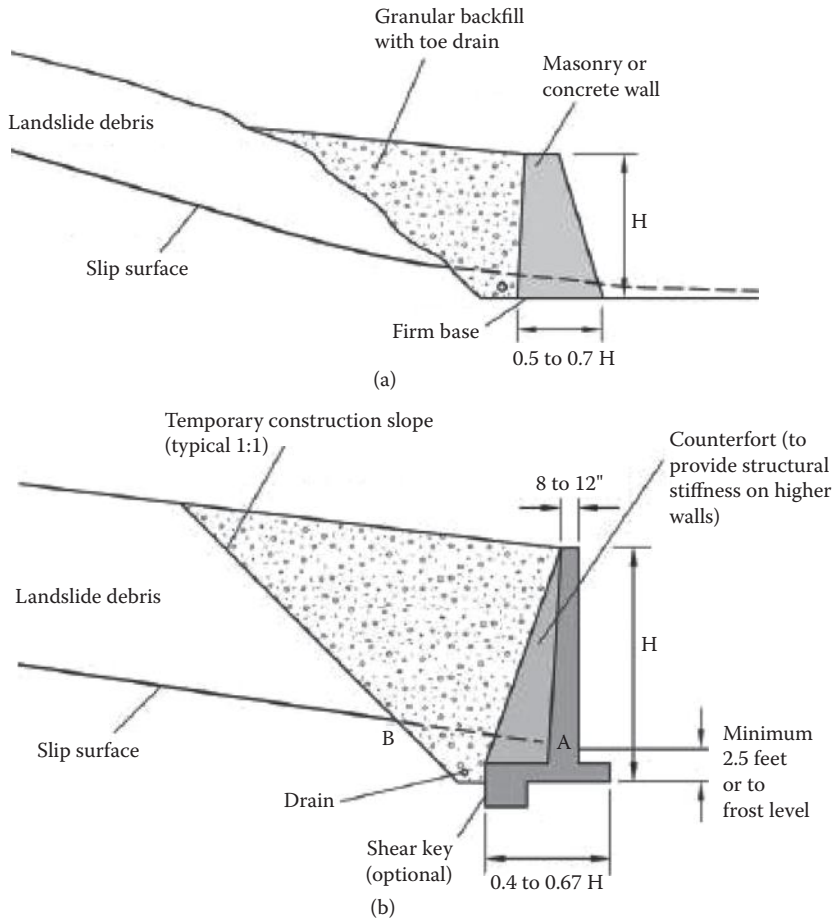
(a) Concrete or masonry gravity retaining wall and (b) concrete cantilever retaining wall. (After Cornforth, D., *Landslides in Practice, Investigation, Analysis, and Remedial/Preventative Options in Soils*, Wiley, 2005.)
